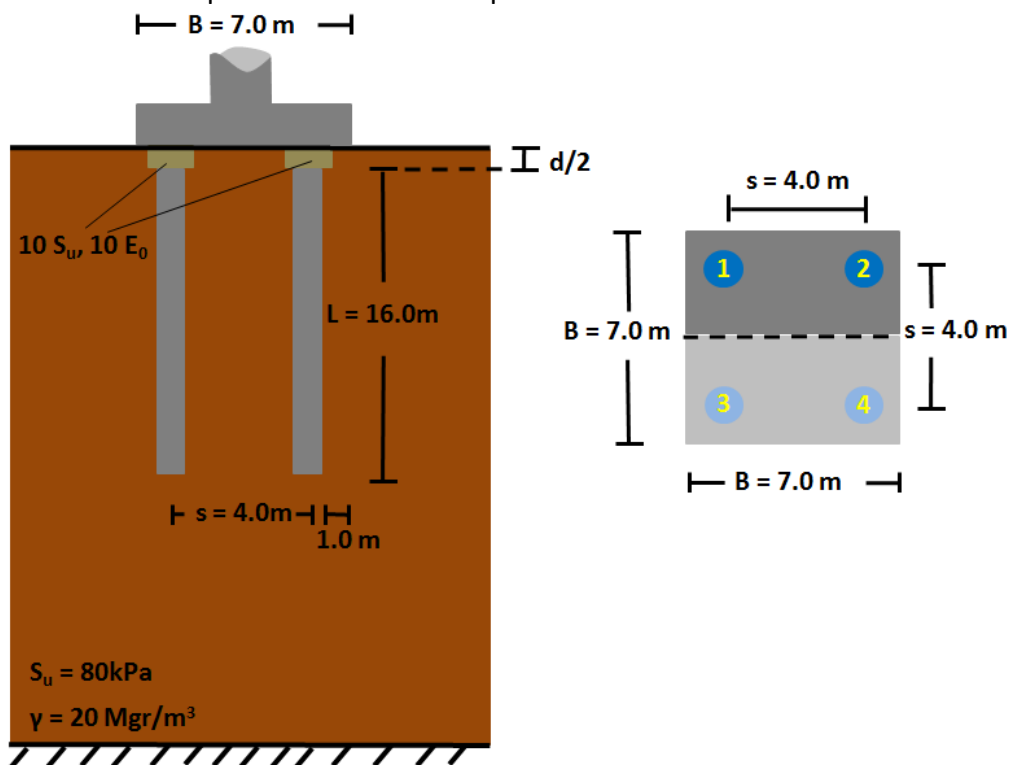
Sixth tested design of unconnected pile foundation.
